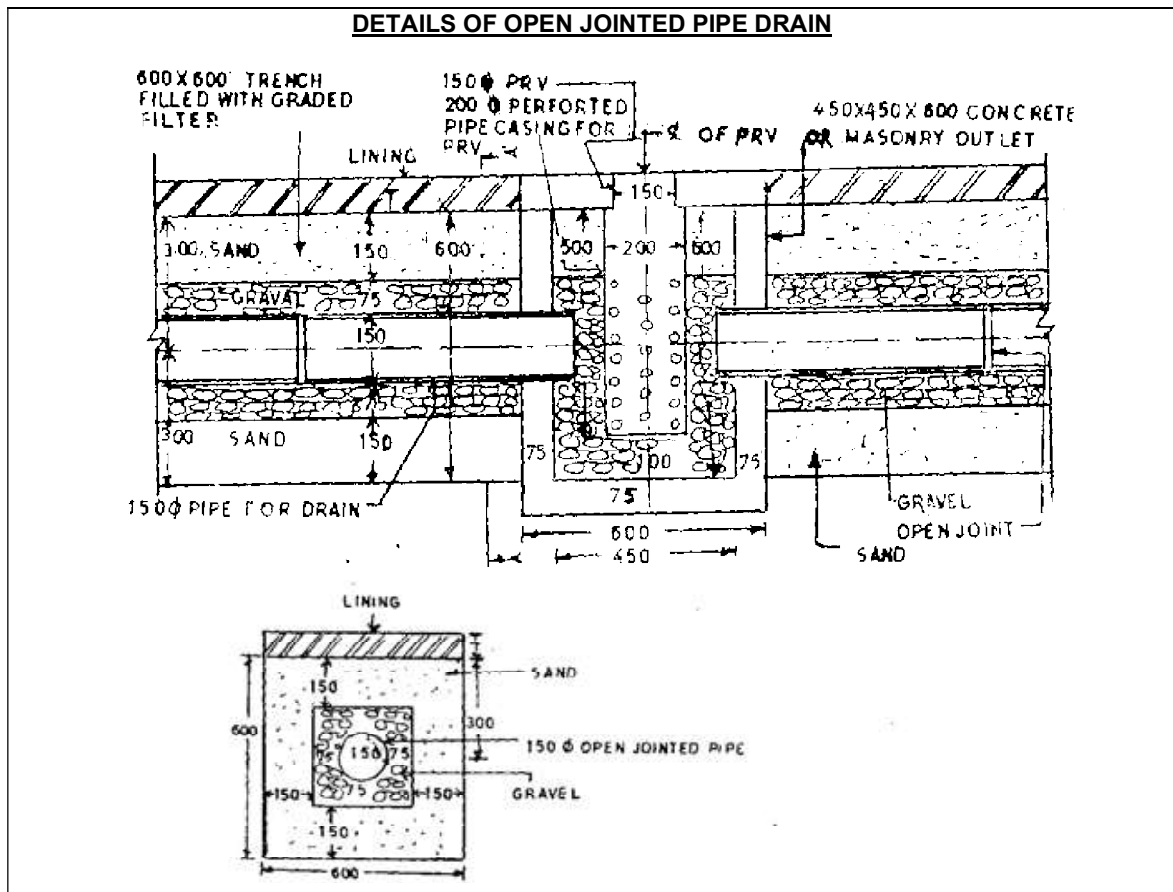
DETAILS OF OPEN JOINTED PIPE DRAIN
